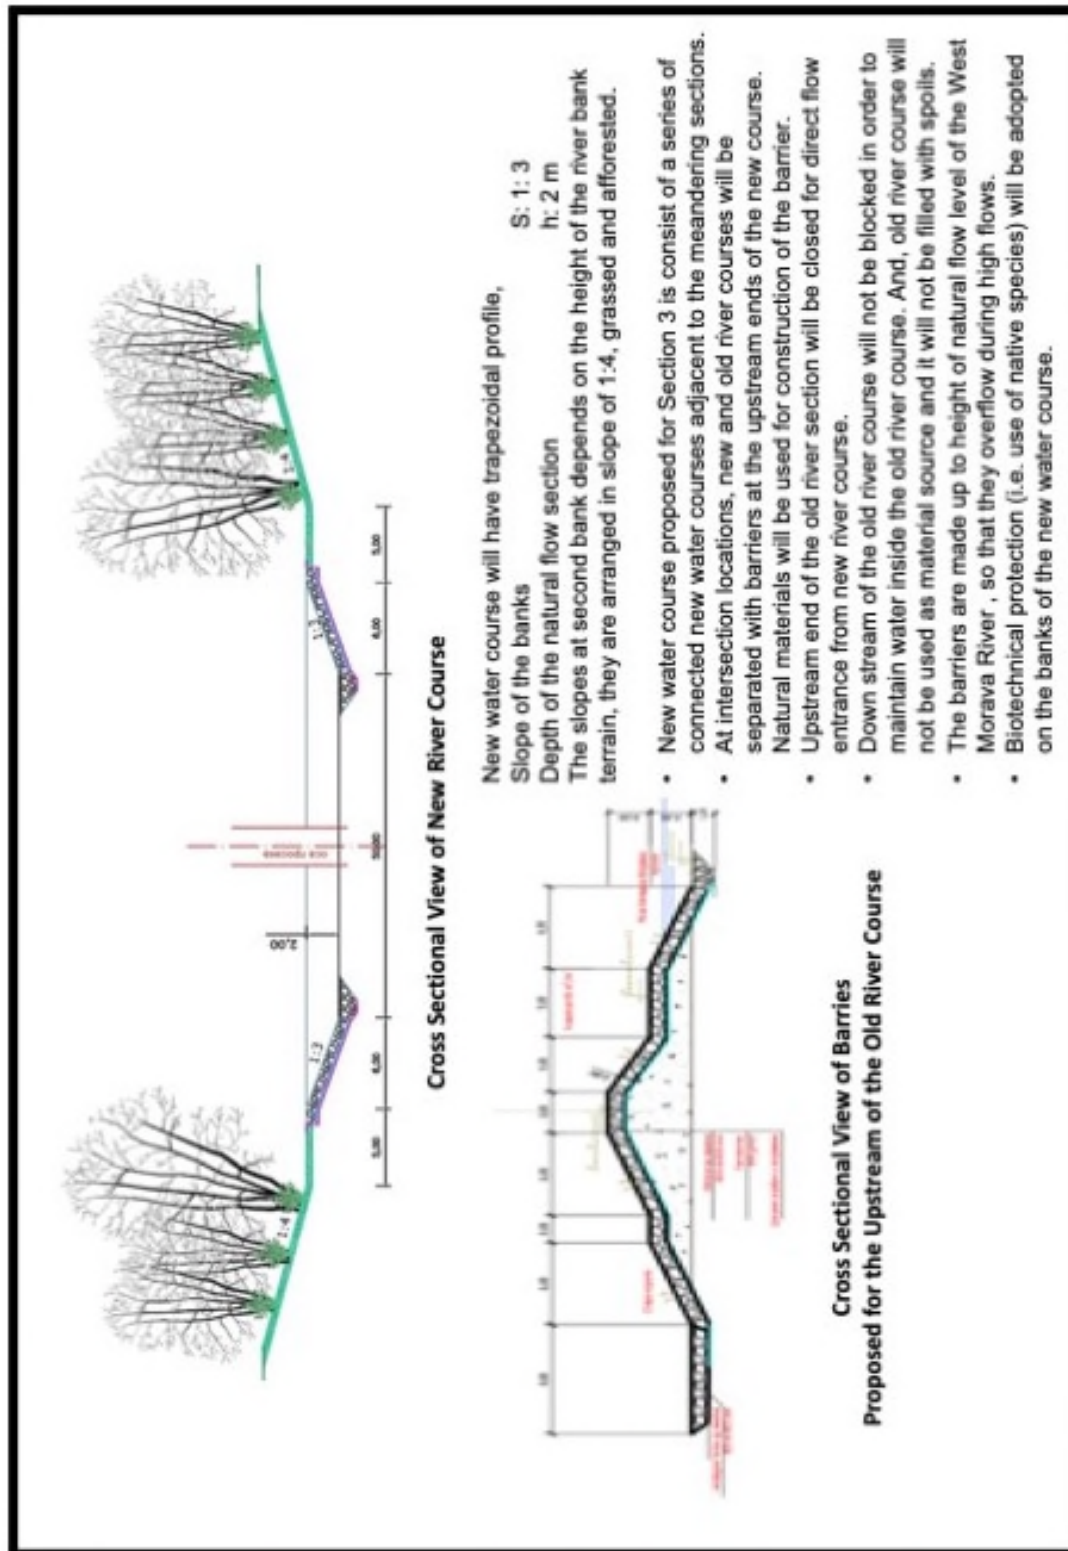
Typical cross-section of the Structure 17, Section-3
